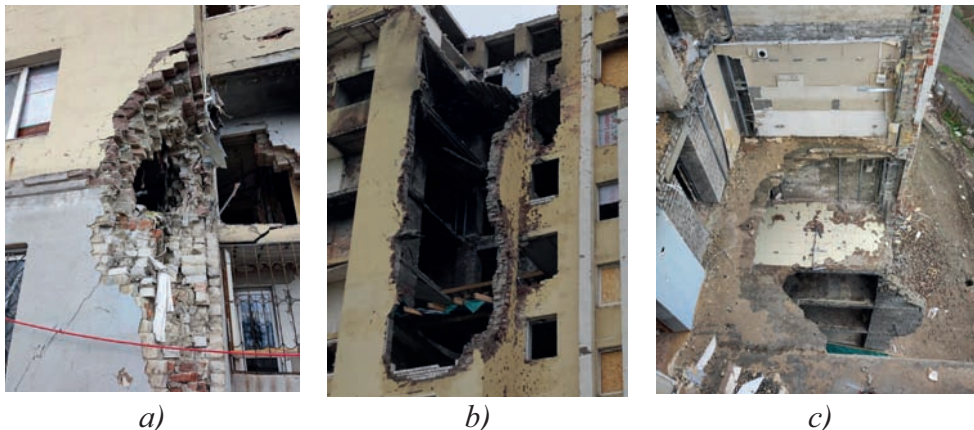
Collapse patterns typical for bearing structures of masonry buildings. Pattern 1: complete destruction of one floor (a); Pattern 2: Complete destruction of a large part of brickwork encompassing several floors and accompanied by destruction of adjacent parts of floor slabs (b); destruction of a part of a building (c)
